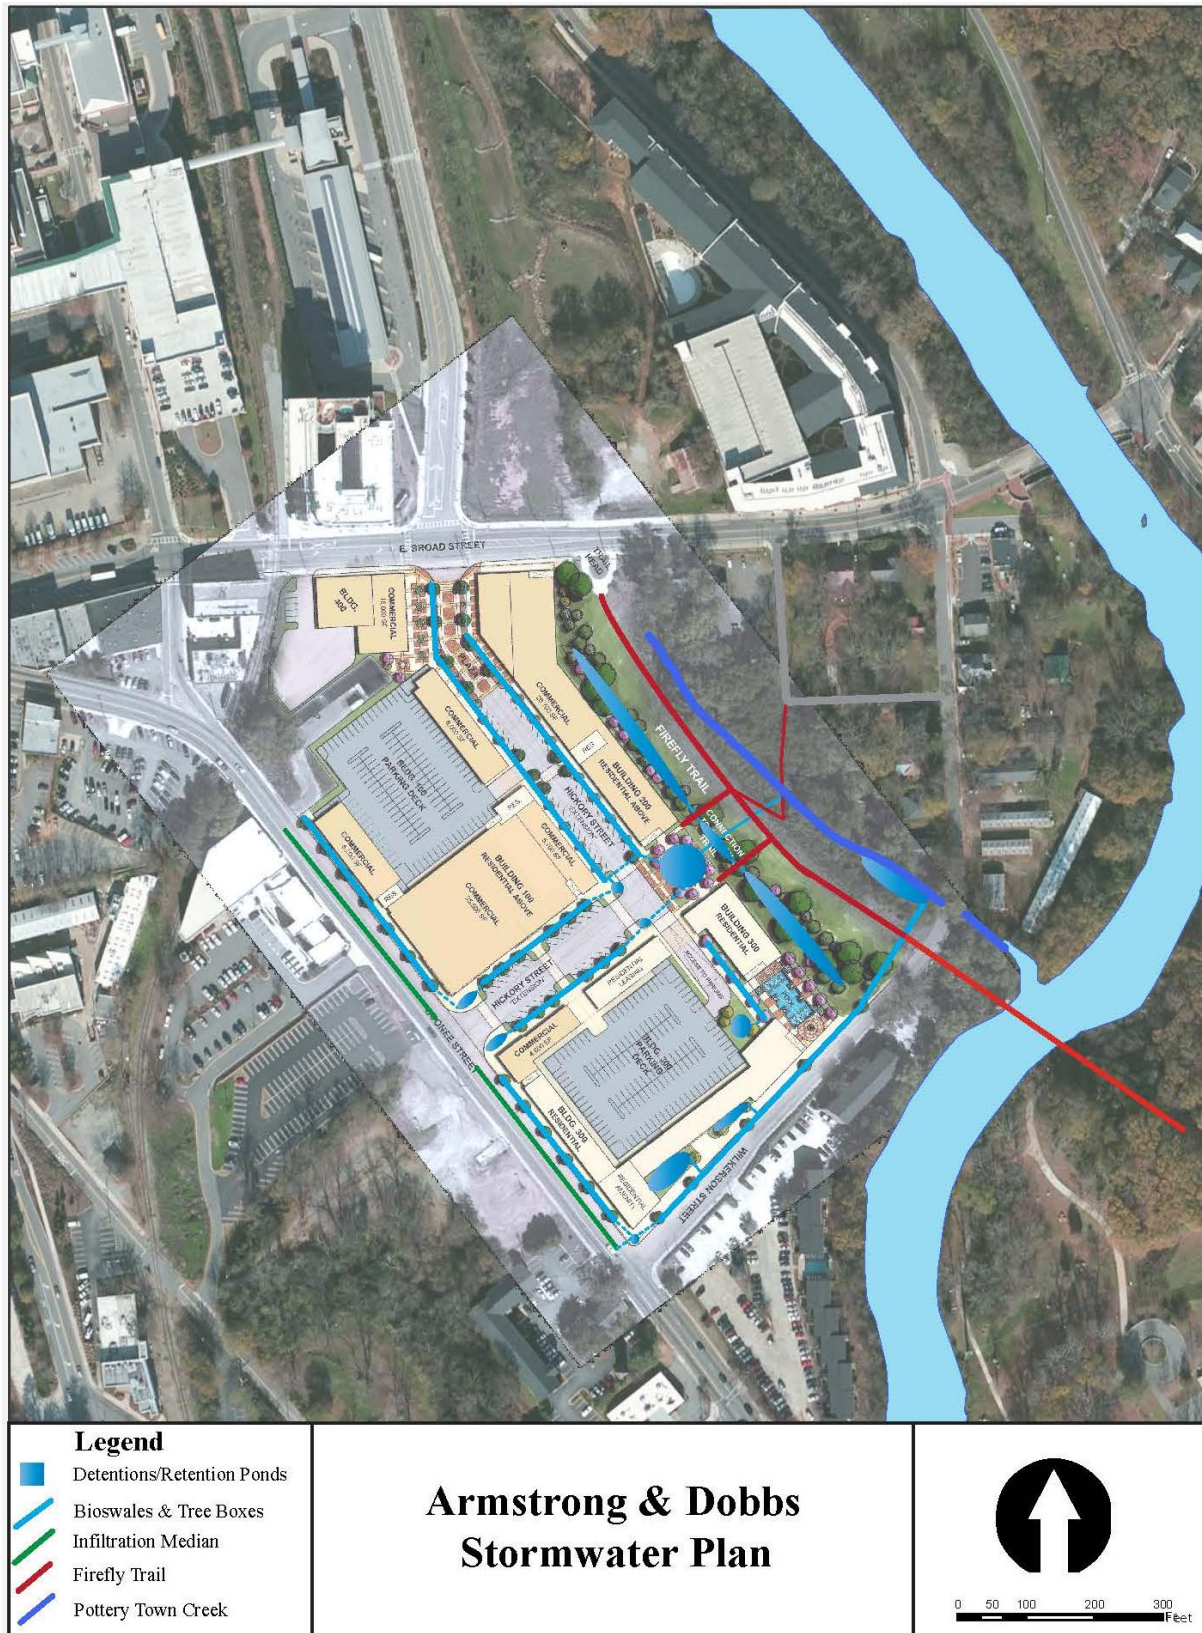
Stormwater Site Plan. This drawing shows both the proposed ponds and the interconnecting bioswales.
